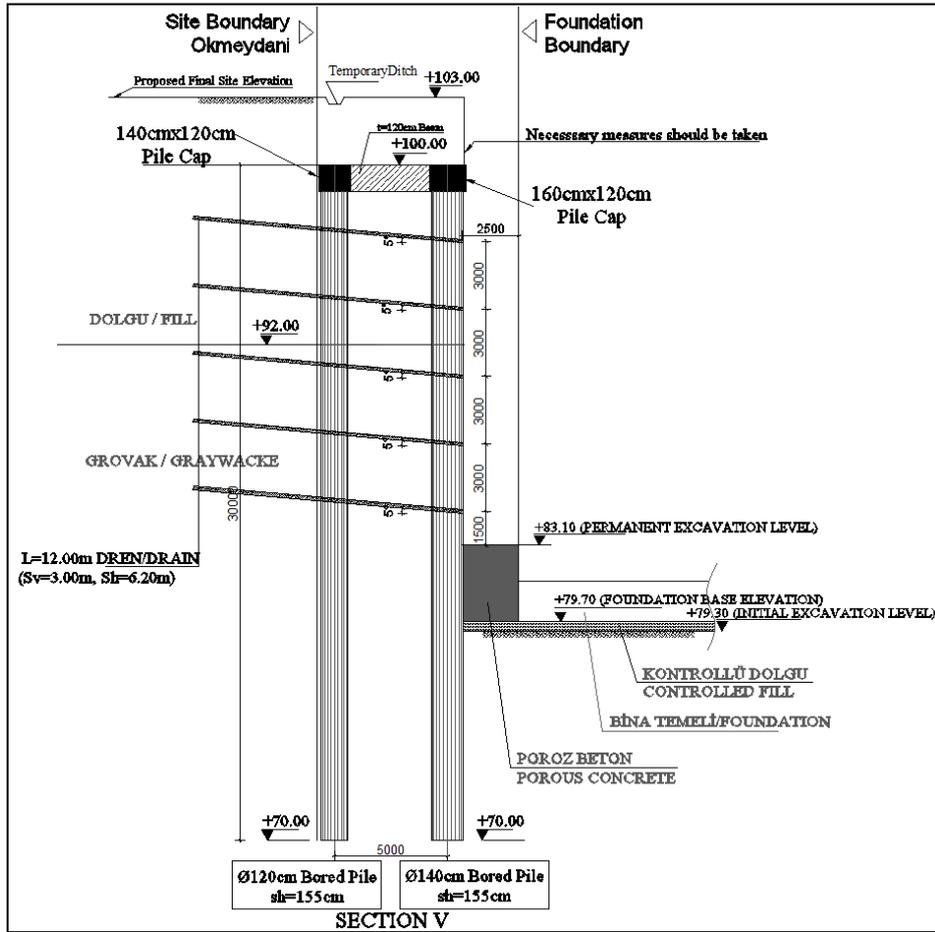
A Typical Section of the Preferred Retaining System Alternative
